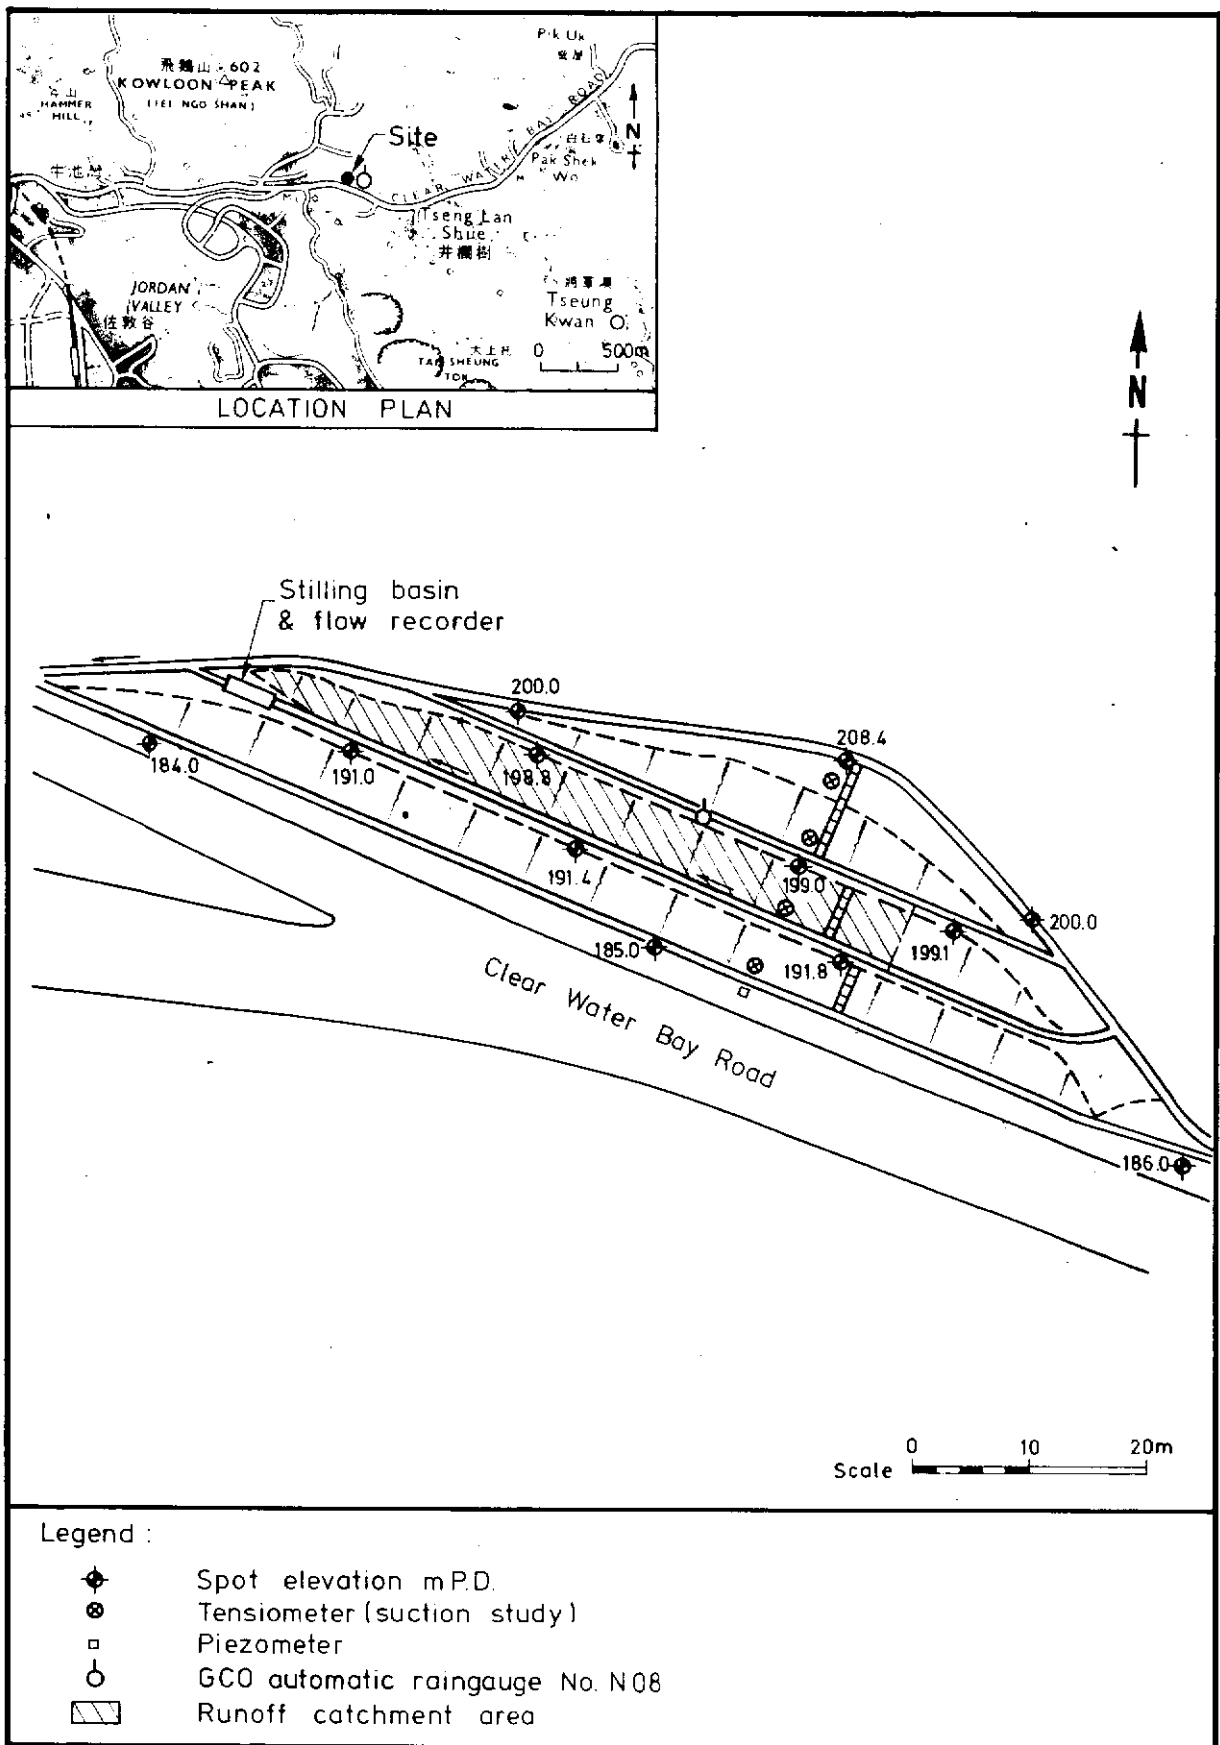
Site Plan for the Runoff Plot on Clear Water Bay Road
